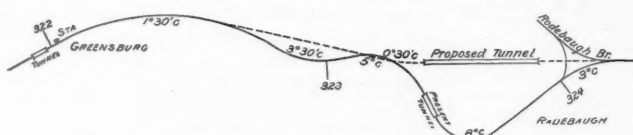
Change of Line and New Tunnel at Radebaugh.
